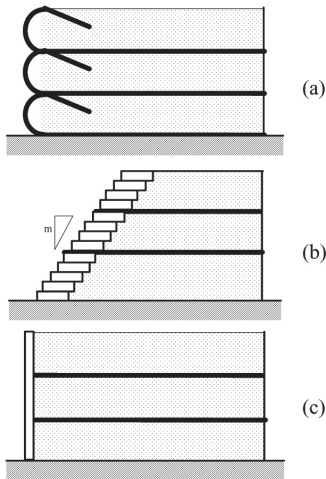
Different types of facing for GRSWs (from top to bottom: Wrapped up facing, segmental block facing and panel facing).
